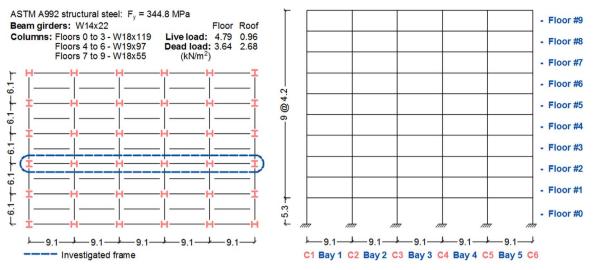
Plan layout, elevation and structural member details of the investigated frame [18]. Frame dimension units are in meters.
